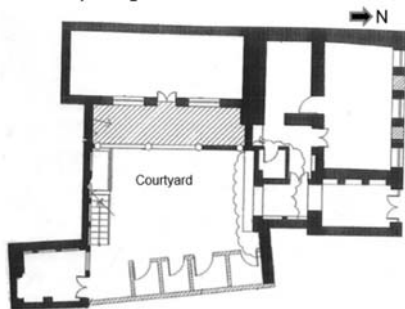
Ground floor plan for Abdullah Al-Zayed's house [12]
